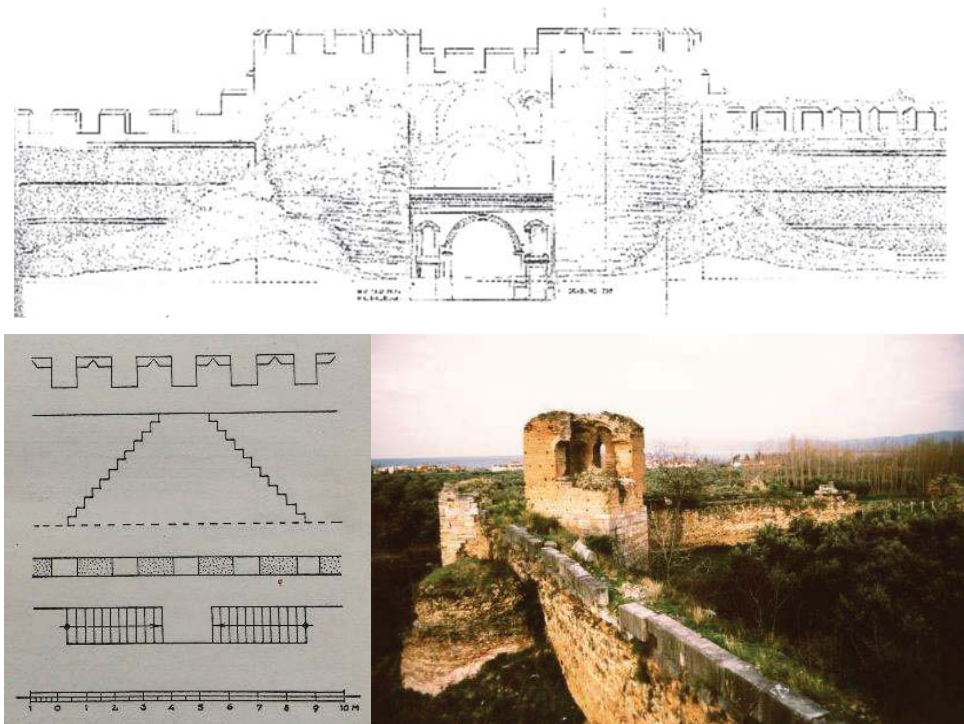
View of the crenelated wall walk and Istanbul Gate (Schneider and Karnapp, 1938) (above and below), wall walk, aerial view (courtesy of Kadir Balı-below right)
